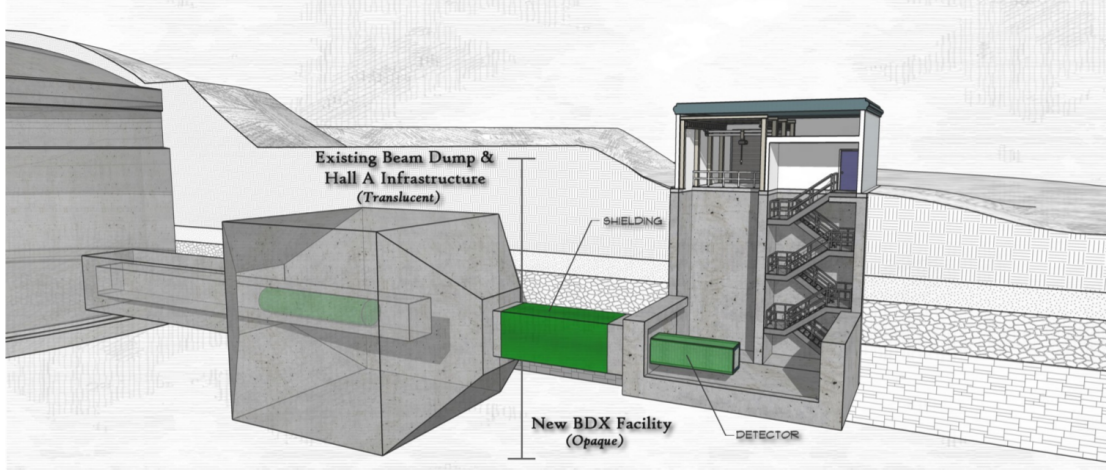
Artist’s conception of the BDX facility. The drawing shows the existing Hall A beam-dump surrounded by a concrete bunker. The new BDX facility will include a staging building on the surface, additional shielding downstream of the Hall A beam-dump, an underground area for the detectors, and stair and shaft access to the surface.
